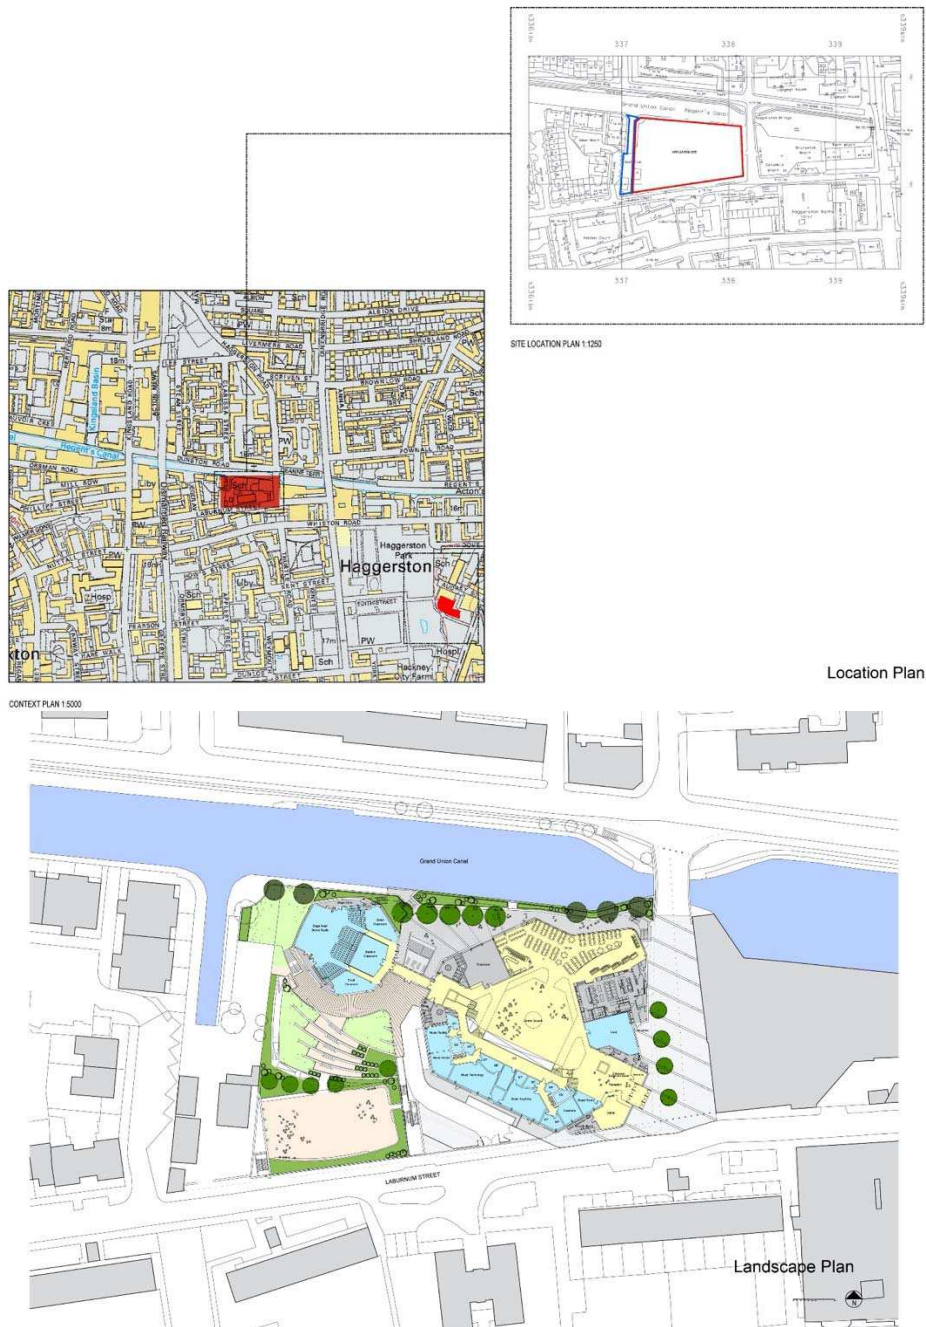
The Bridge Academy site: location plan and landscape plan. (© BDP Architects)
